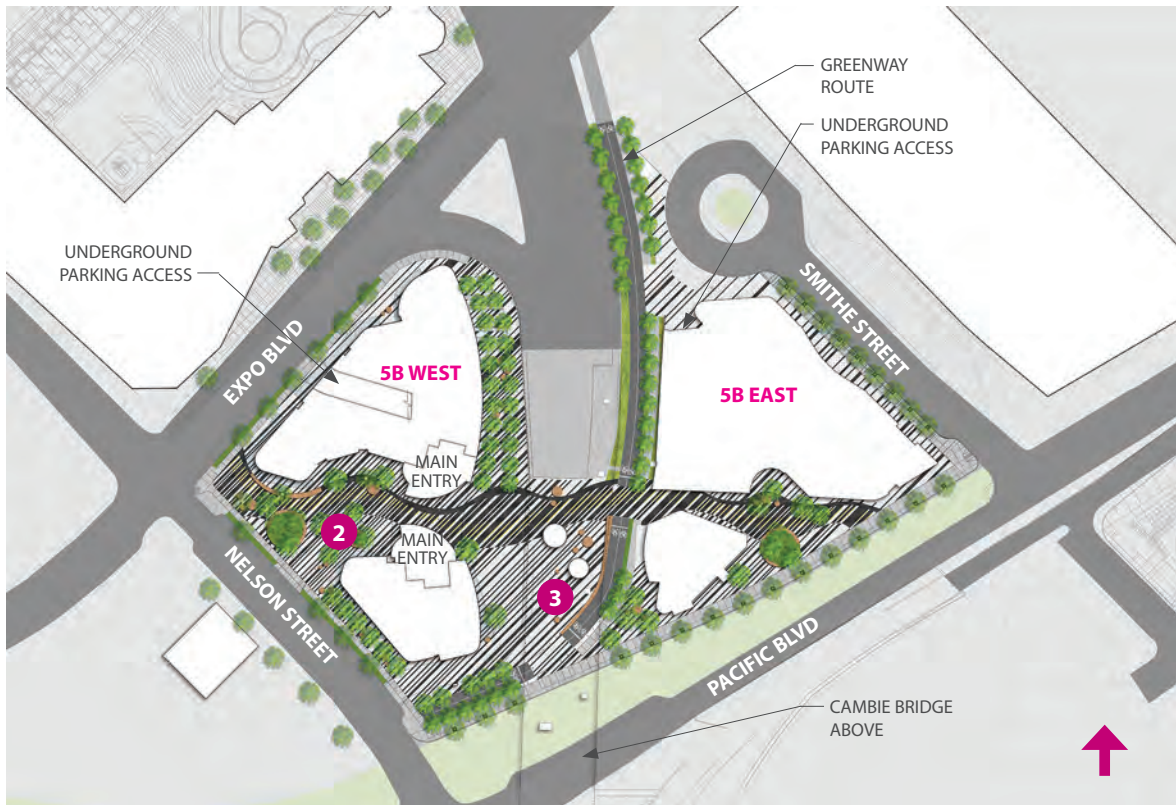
Rendered Site Plan for the Area 5B site (East and West). Image by PFS Studio.
